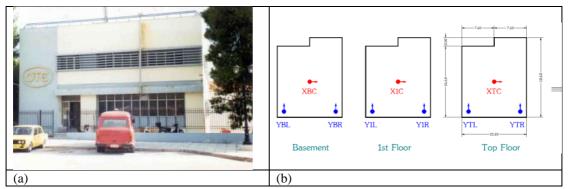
(a) OTE building at Thrakonakedones (b) instrumentation layout
